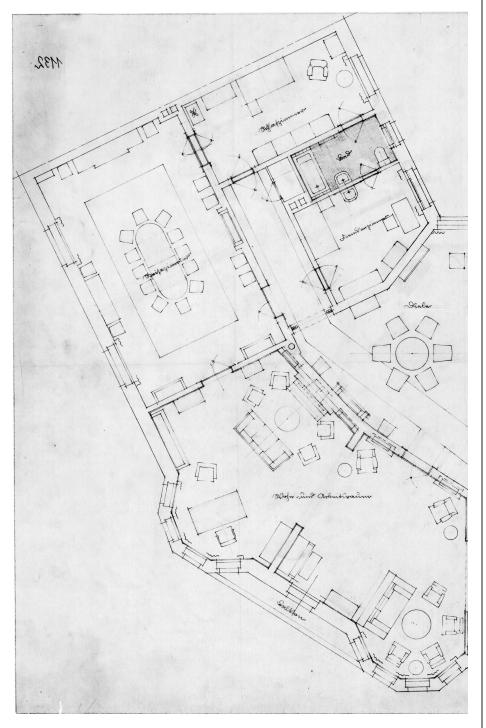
Undated floor plan of Hitler's apartment on 16 Prince Regent Square in Munich after the 1935 renovation by the Atelier Troost.
